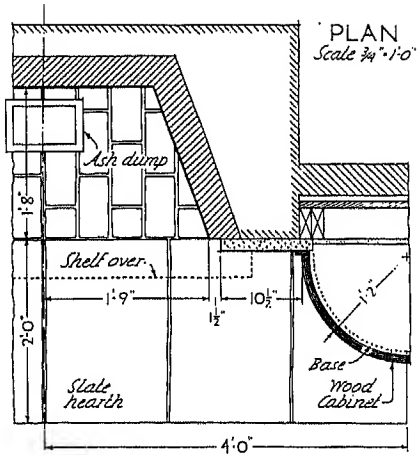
A shallow fireplace with a copper hood, built as shown, throws out considerable heat after the hood gets hot. The wall should be of fire-resistant masonry.
